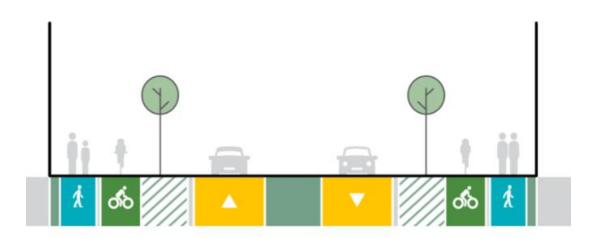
Proposed cross section of new roadway demonstrating ability to plant new street trees in a berm area.
